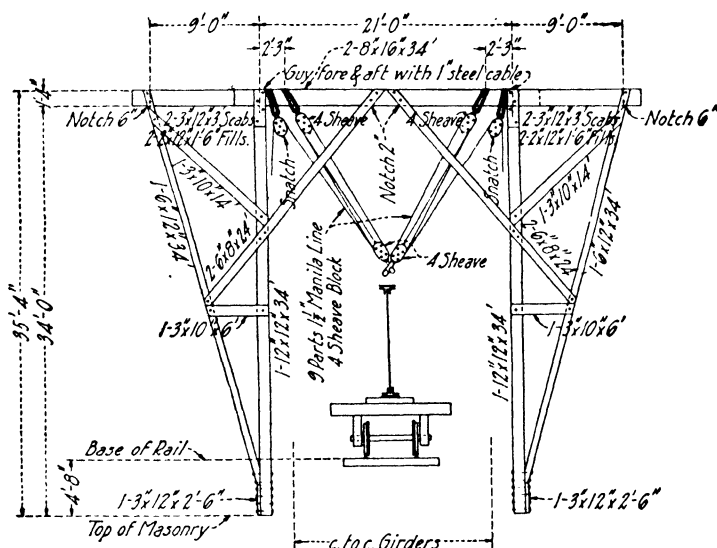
DETAILS OF A GALLOW'S FRAME. AMERICAN BRIDGE COMPANY.
